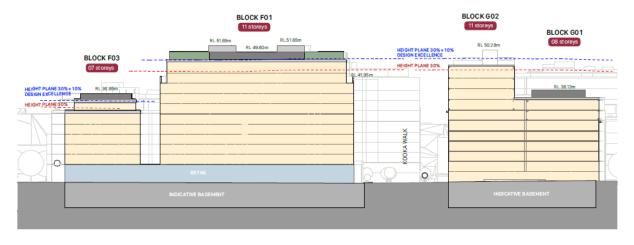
Proposed amended sections - buildings F and G (east-west) fronting Macdonald Street
